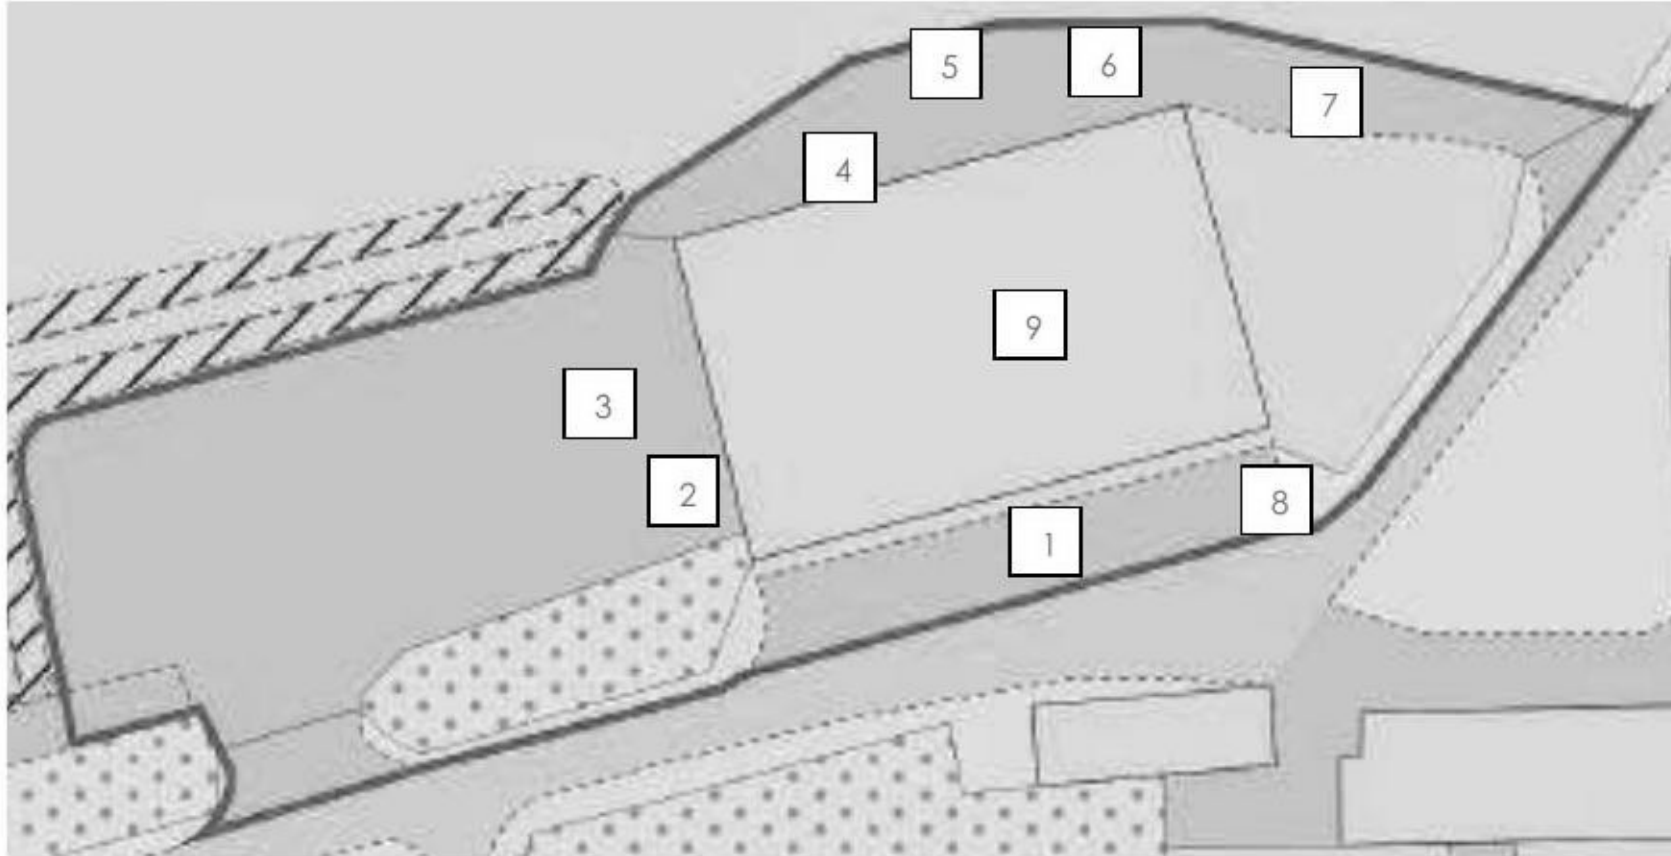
Numbered Site Layout Plan Corresponding with Photographic Record below
